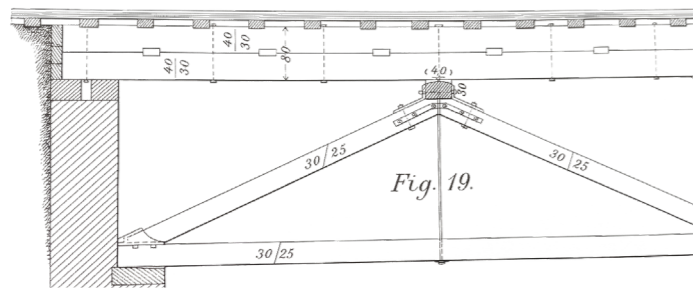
Bridge with timber compression struts (Henket et al., 1889)
